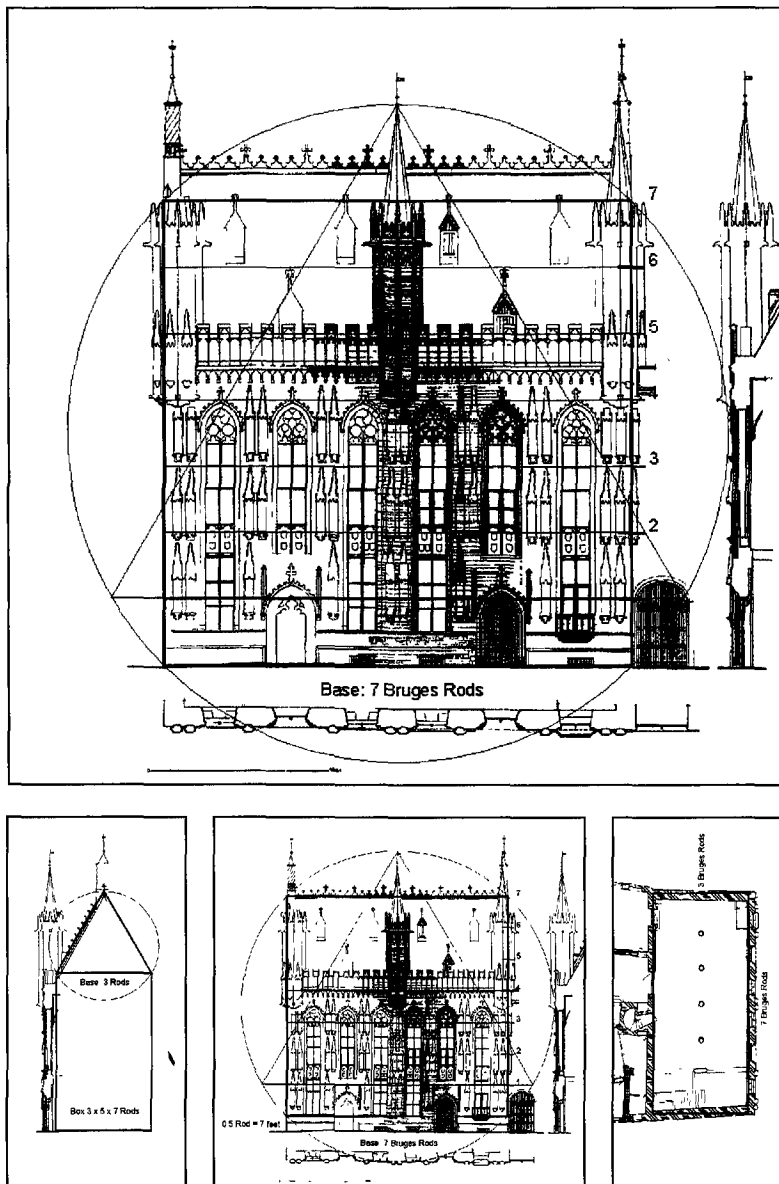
facade composition for Brugge; relations between plan & elevation, shifted scheme (7 feet)
